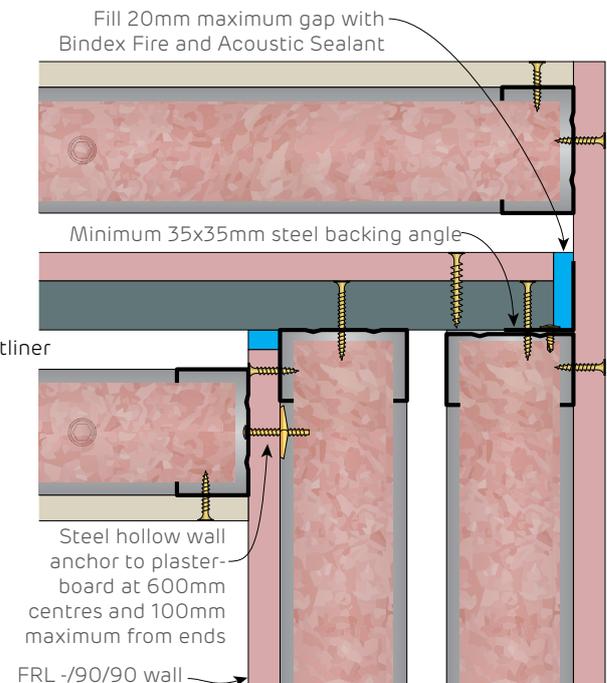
Interhome Highrise Wall Connection to Fire Rated Plasterboard Wall
